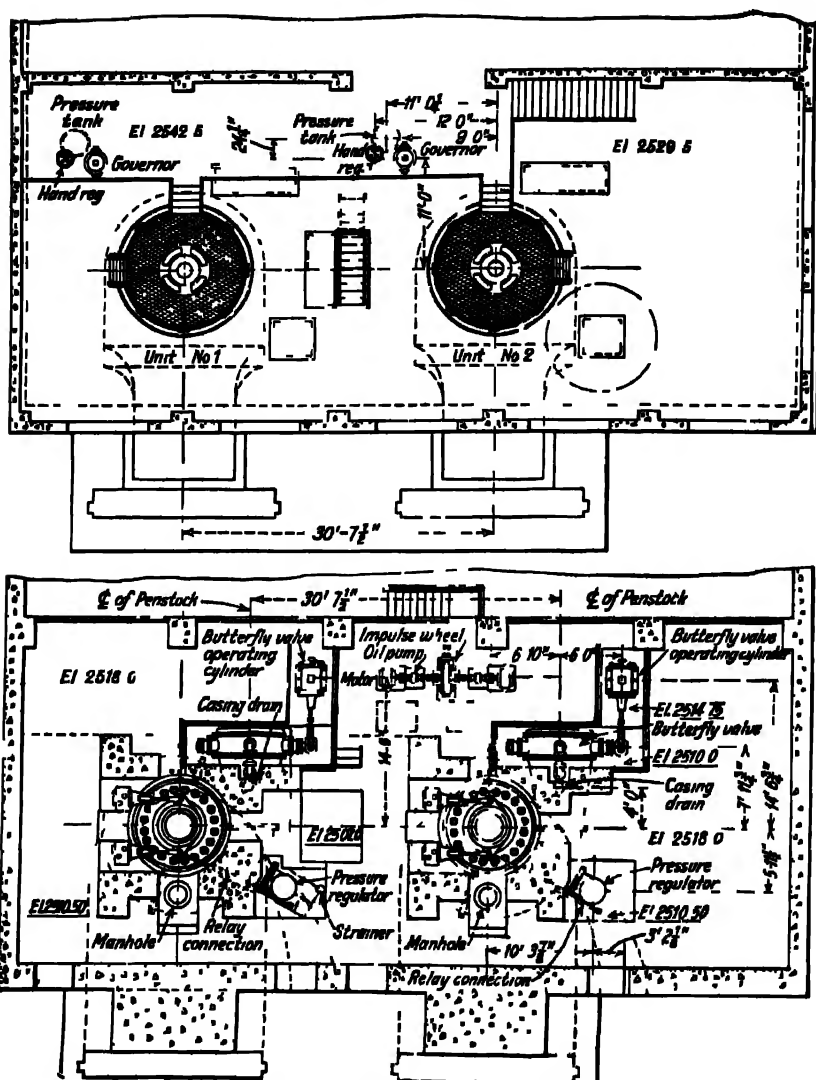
Vertical cast-steel spiral-cased turbine for high head, 18 000-hp, 420-ft head, 375 rpm Keihin Denryoku Electric Power Co Japan, showing three-floor arrangement with switchboard floor at exciter level main floor at generator base, and turbine floor at cover-plate level with an inspection floor below turbine. Penstock enters horizontally with hydraulically operated butterfly valve. Cast-steel casing made in three sections; pressure regulator with plate-steel discharge pipe, concrete-elbow draft tube with removable cast-iron section below runner. Governor stands and controls located on switchboard floor; motor and impulse wheel-driven oil pumps located on turbine floor. (Allis-Chalmers)
